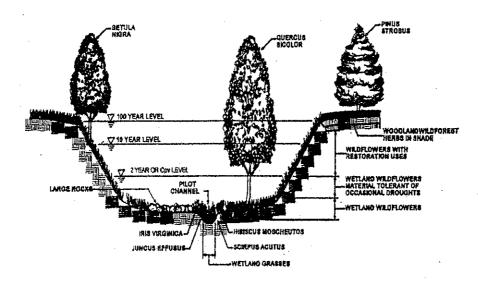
Section of Typical Shallow Extended Detention Wetland System
